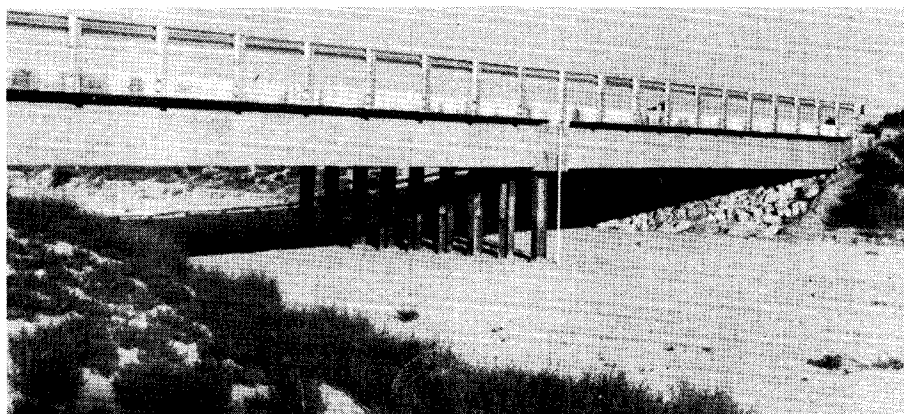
View of downstream side of Harper Lake Road bridge at mile 84.41 near Helendale.
